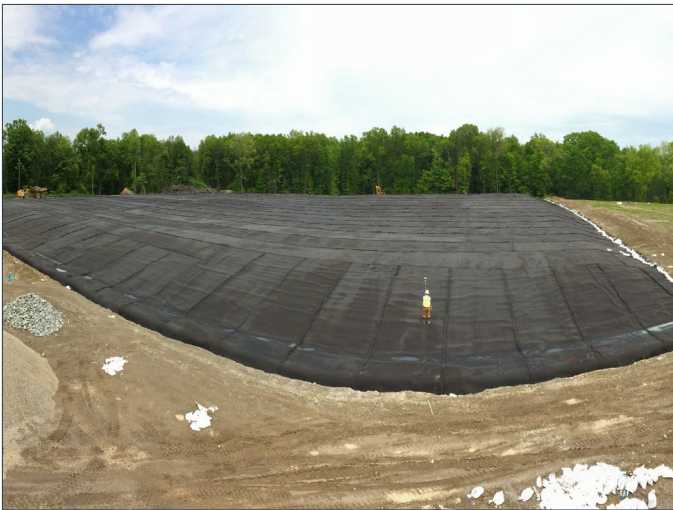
View of installed top liner of Containment Cell cap permanent section
